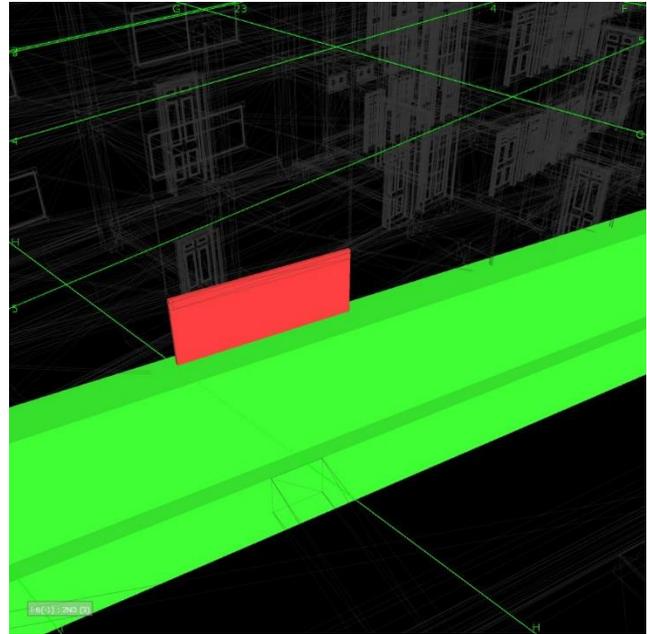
Clash between structural beam G1 (Green) and curtain wall C4 (Red)
